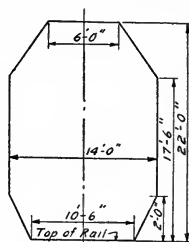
Vertical Section of Clearance Dimensions on Bridges.
